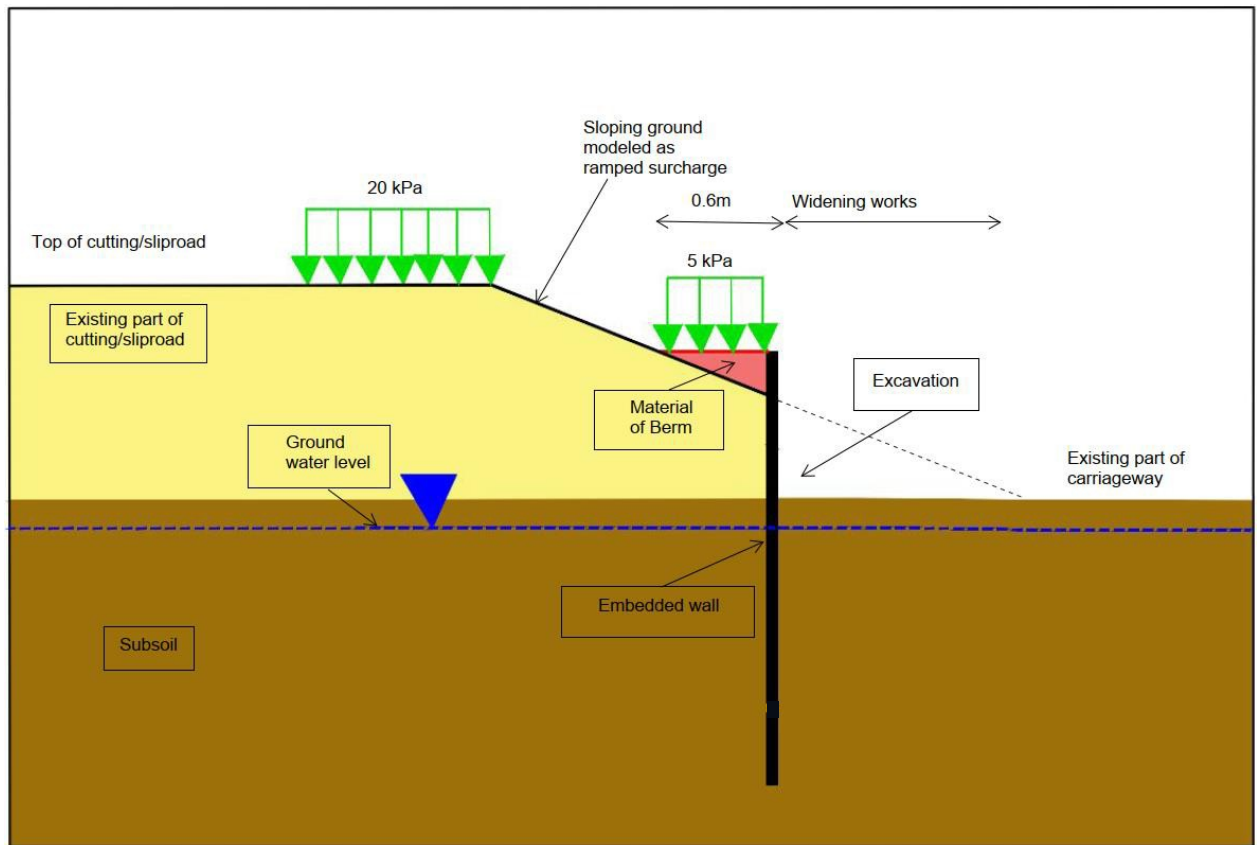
Schematic cross section of an embedded retaining wall solution for cutting widening.
